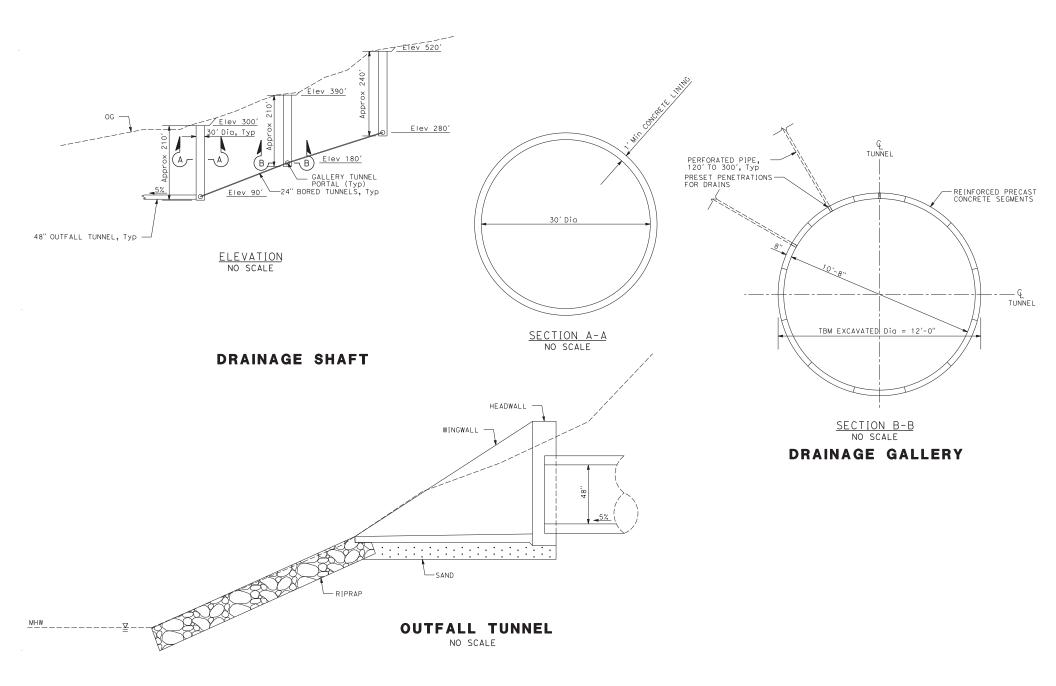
Alternative X Drainage Gallery Cross-Sections
